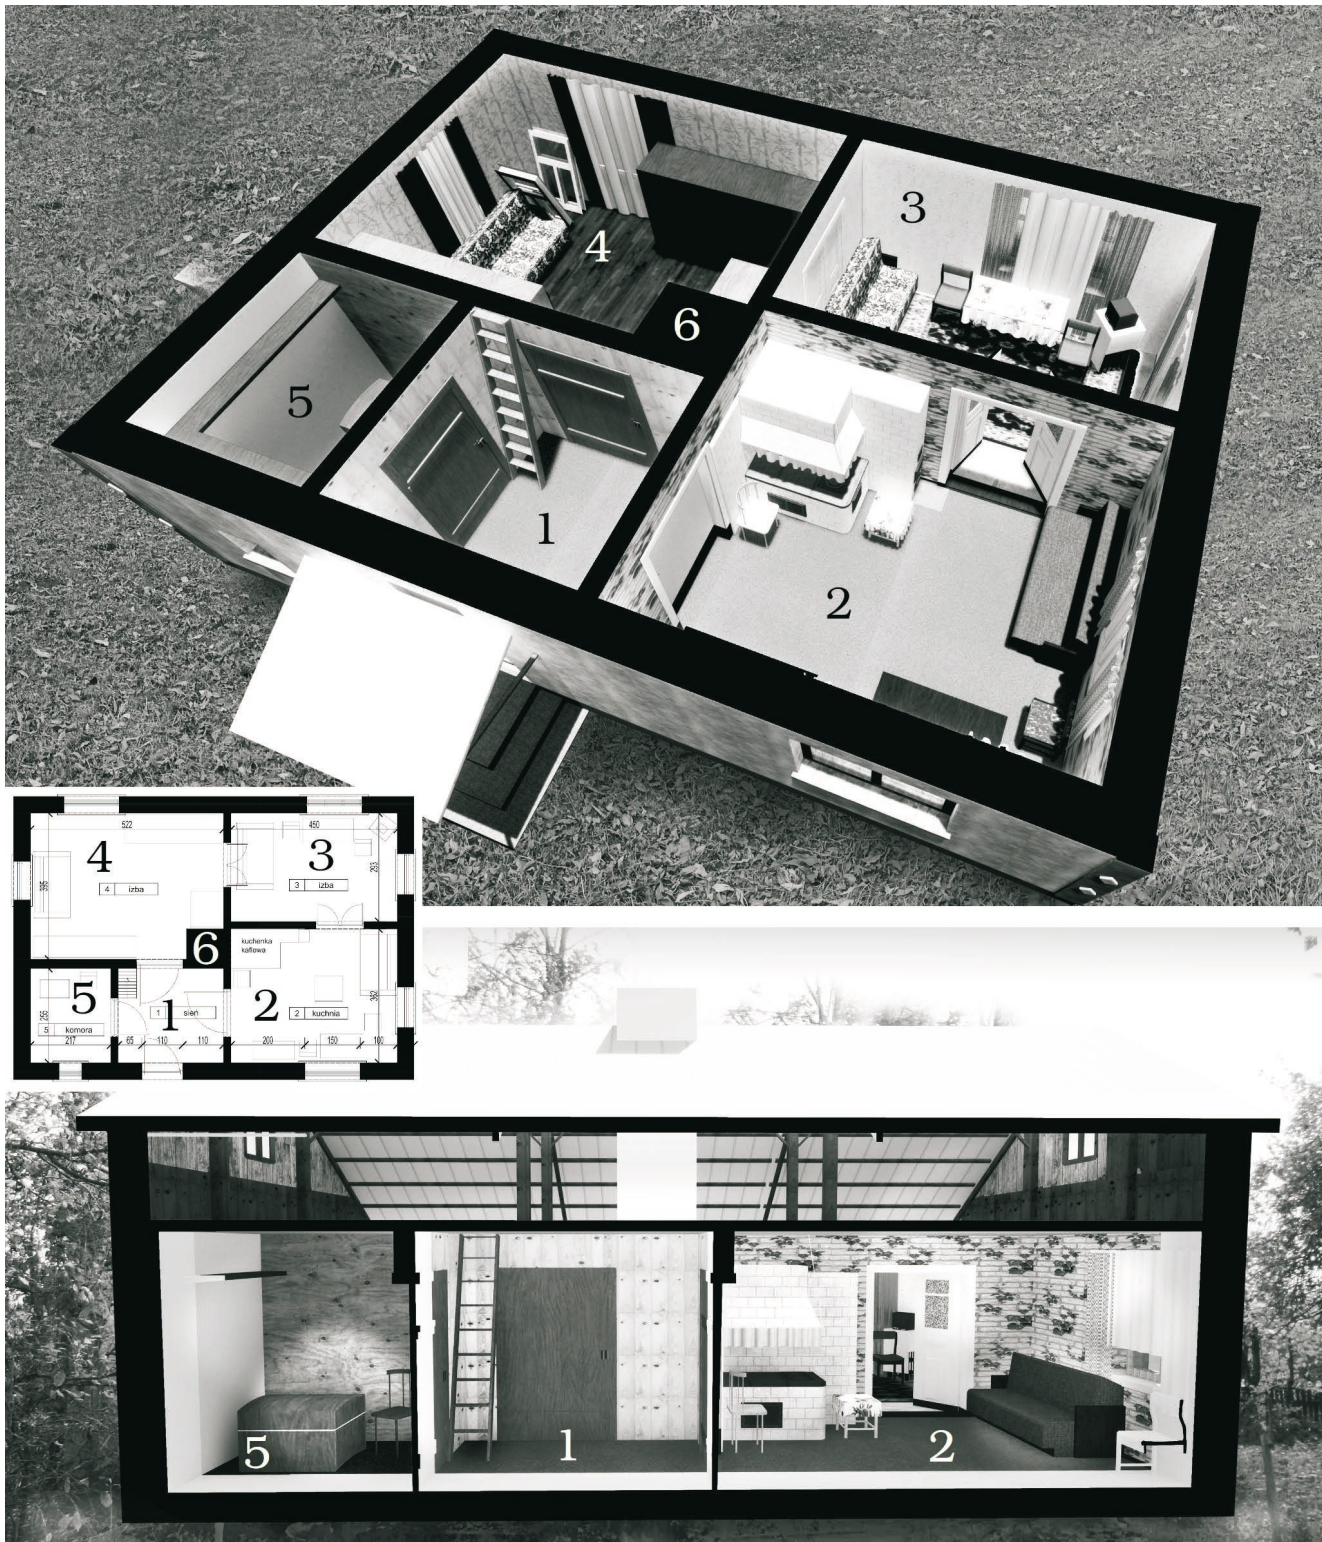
/a-c. House layout (plan and 3D schemes): 1 - hall, 2 - kitchen, 3 - sleeping room, 4 - living room, 5 - storeroom, 6 - stove and chimney; source: the authors, 2022
